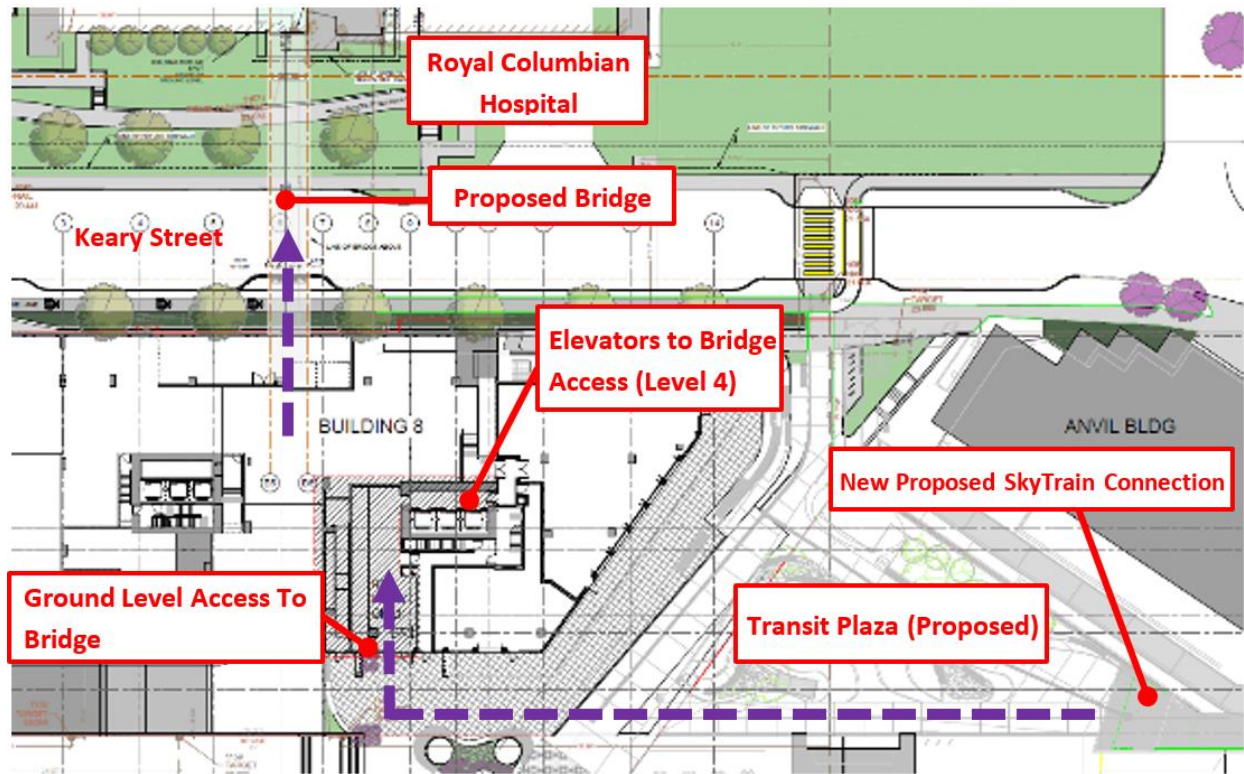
Site plan showing circulation and access to bridge from the SkyTrain in purple
